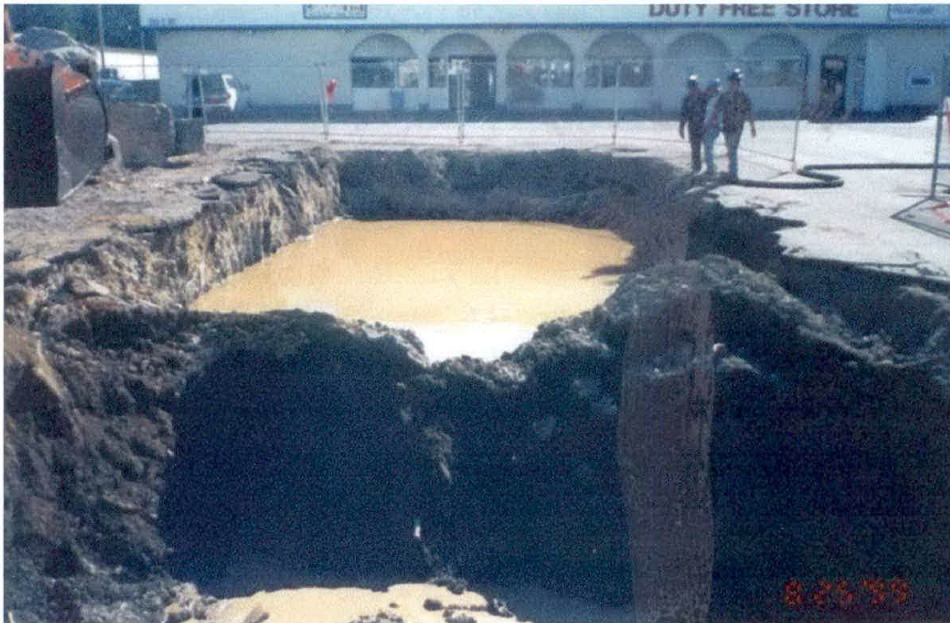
Subject property view to the east. Photograph of water in the tank pit. Water in the foreground is at a deeper elevation due to a clay wall that was created to aid in excavation.
